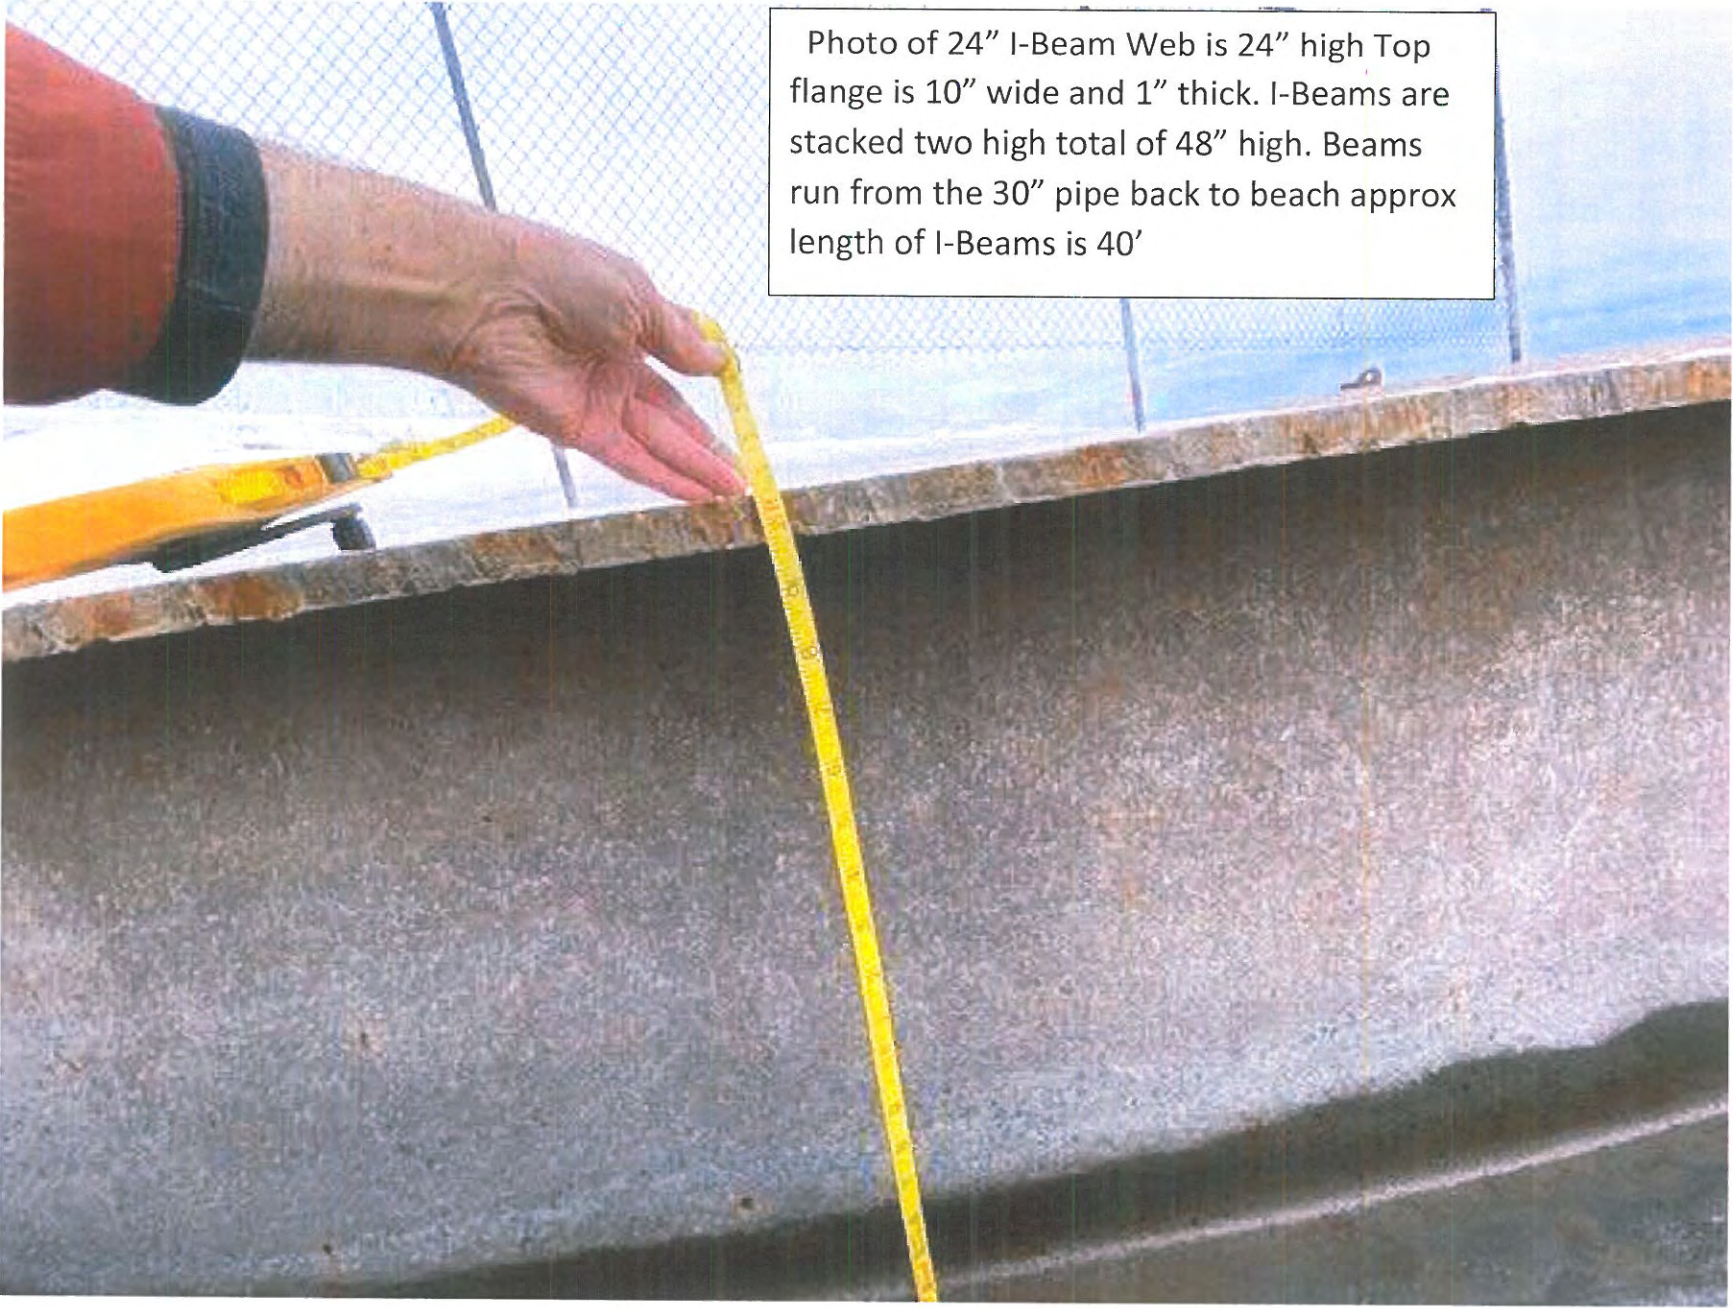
" I-Beam Web is 24" high Top flange is 10" wide and 1" thick. I-Beams are stacked two high total of 48" high. Beams run from the 30" pipe back to beach approx length of I-Beams is 40'
